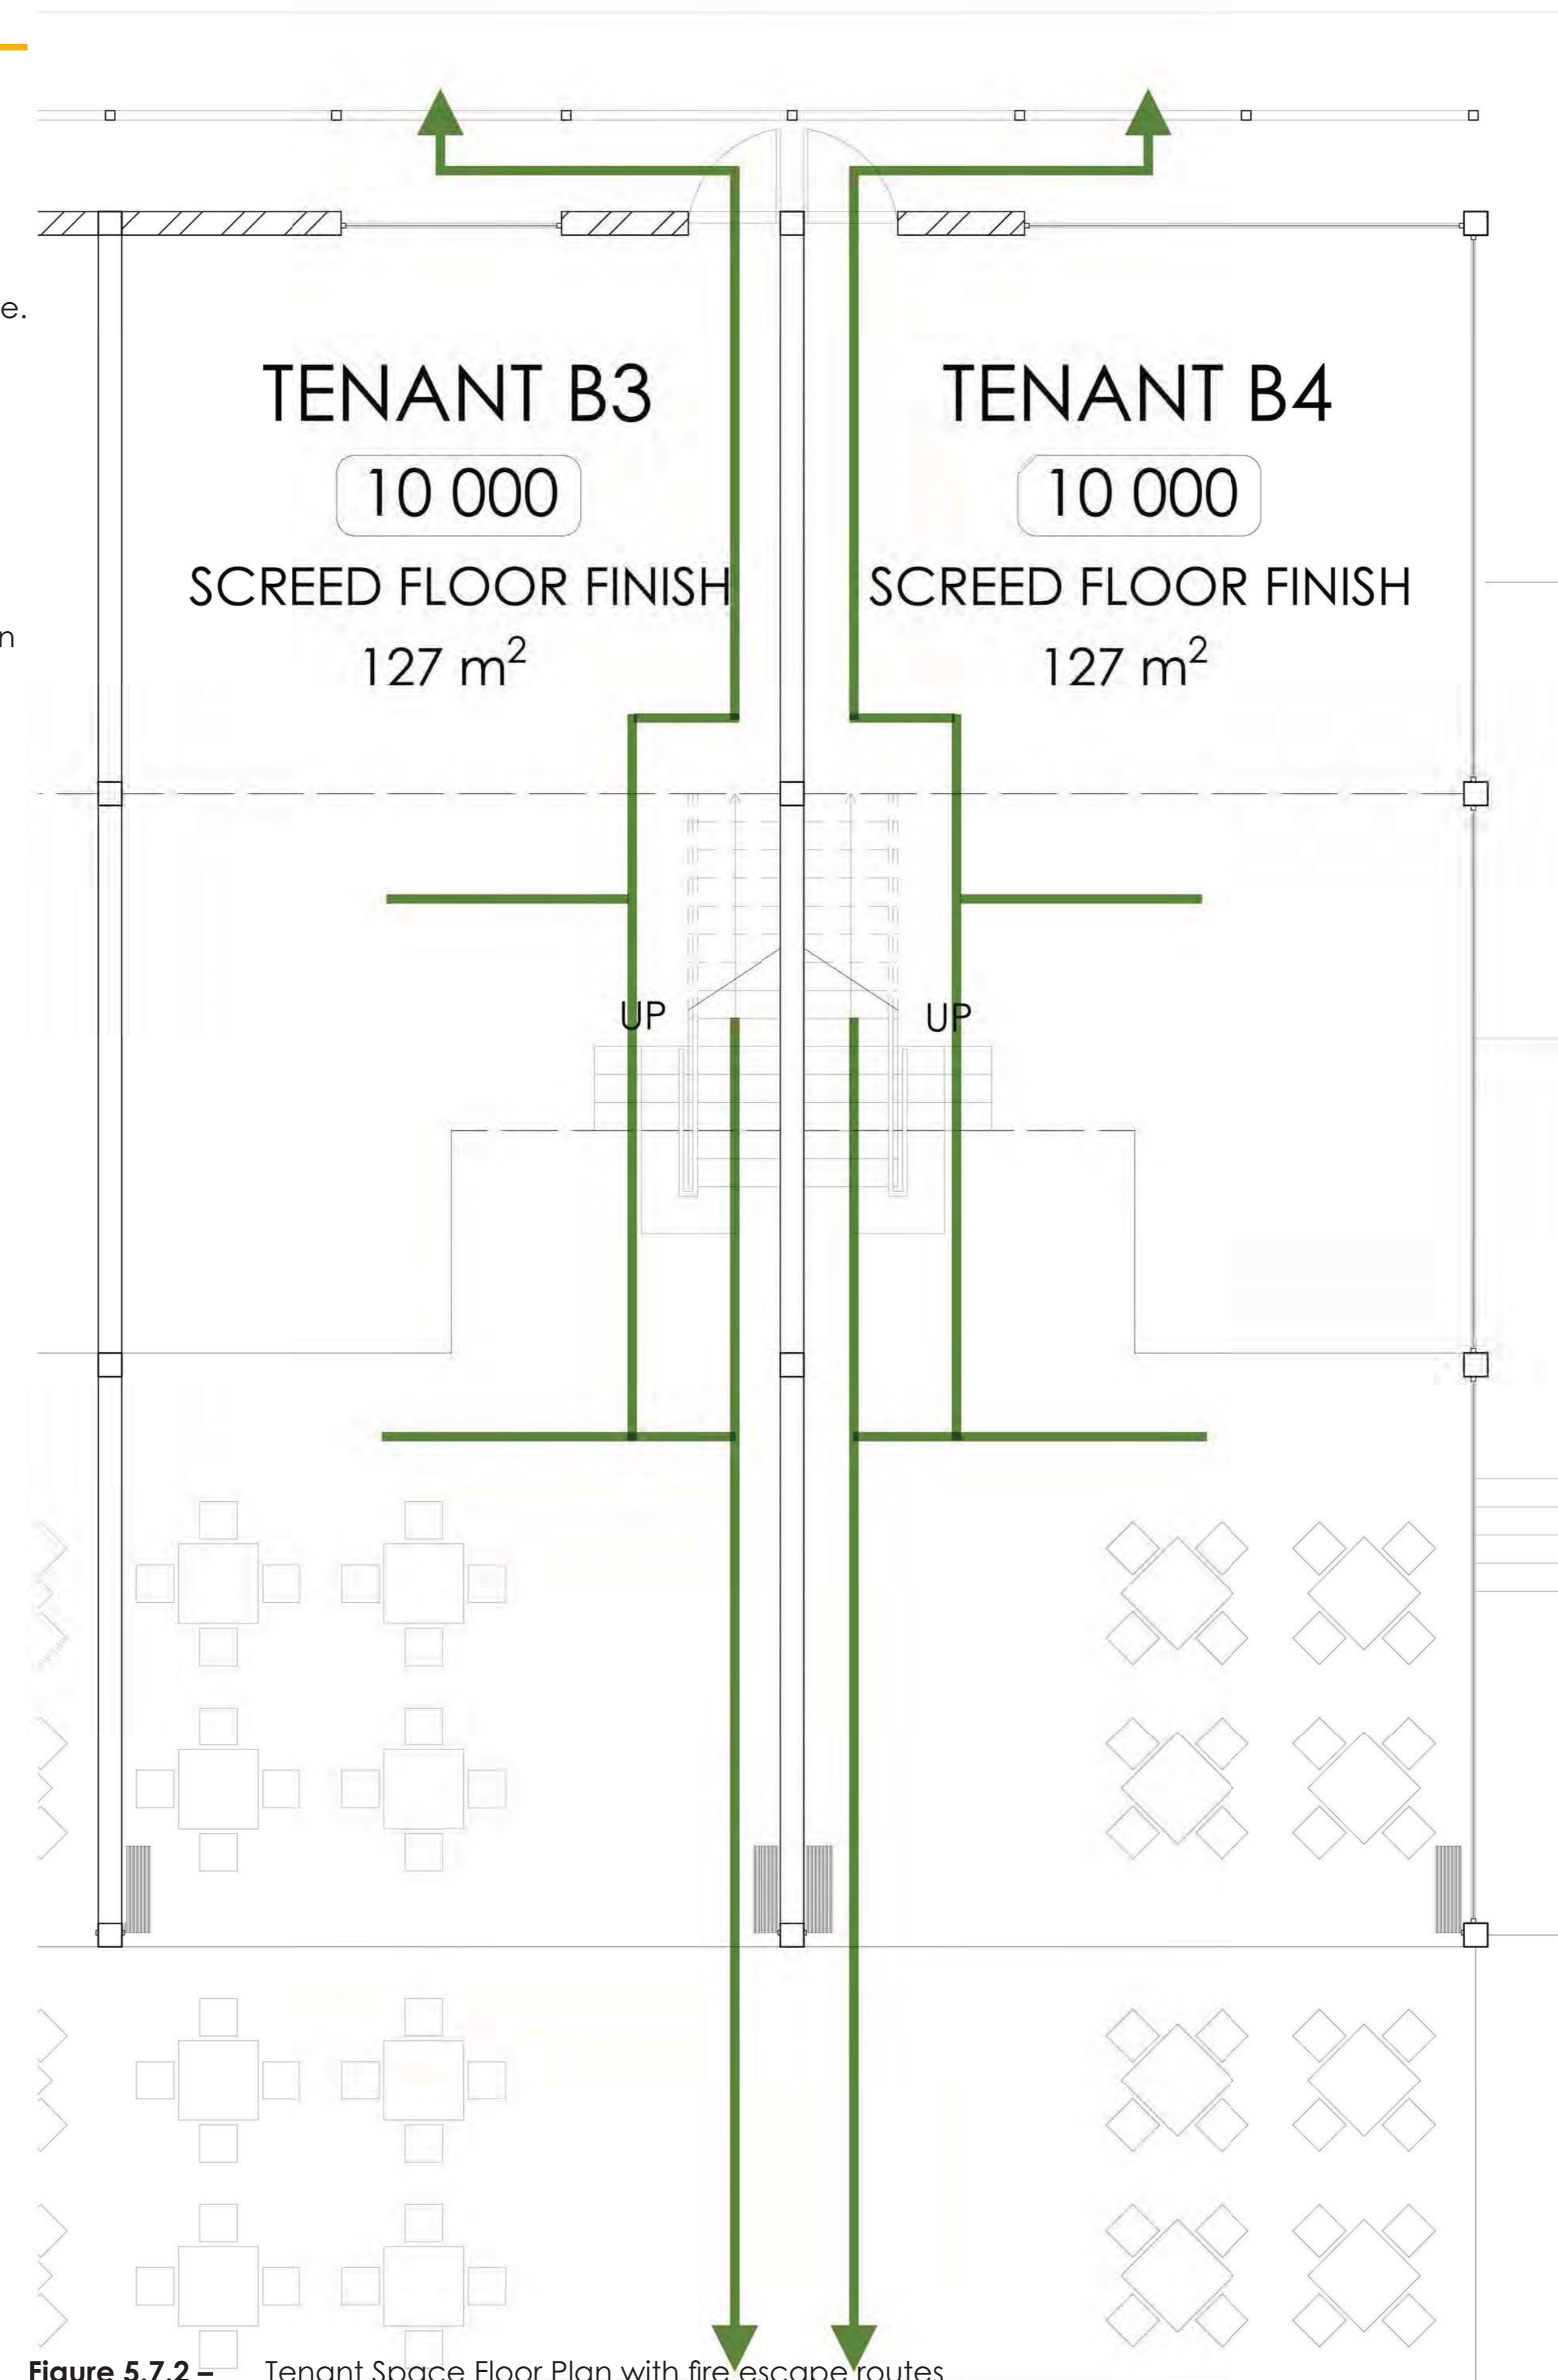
Tenant Space Floor Plan with fire escape routes Scale 1:50
